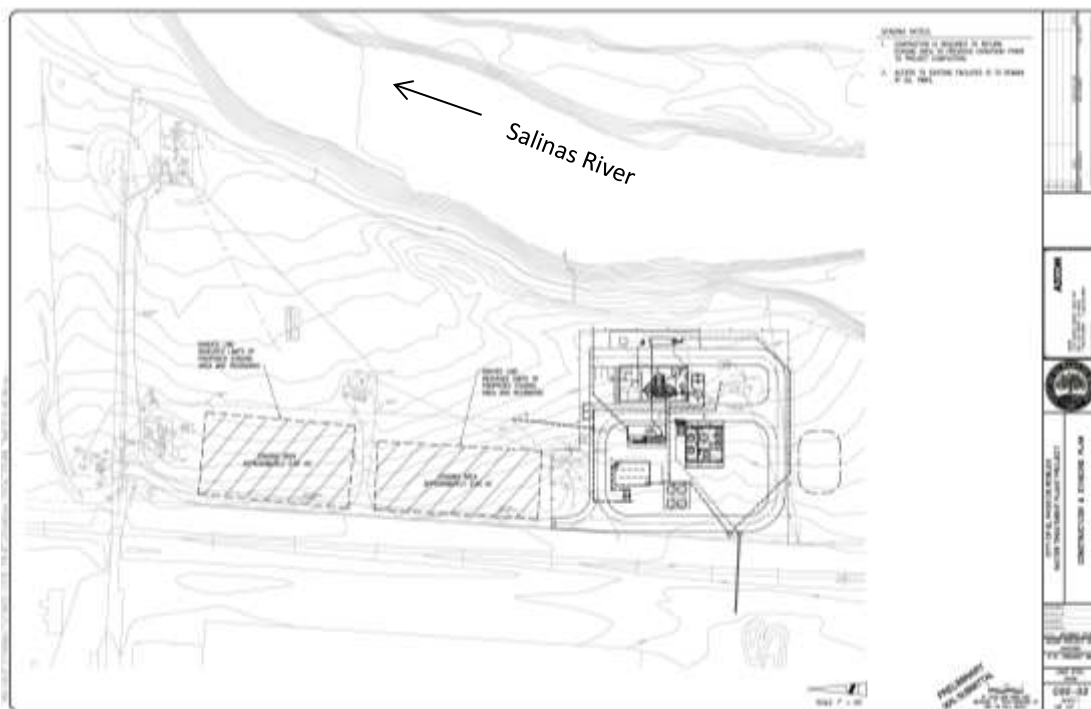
Plan View of City of Paso Robles Lake Nacimiento Water Treatment Plant Site
